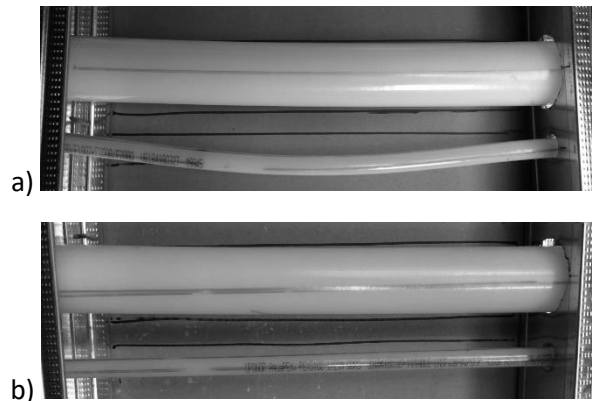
Test 3 Horizontal Pipe Deflections at the a) Top and b) Bottom of the Wall [2]
